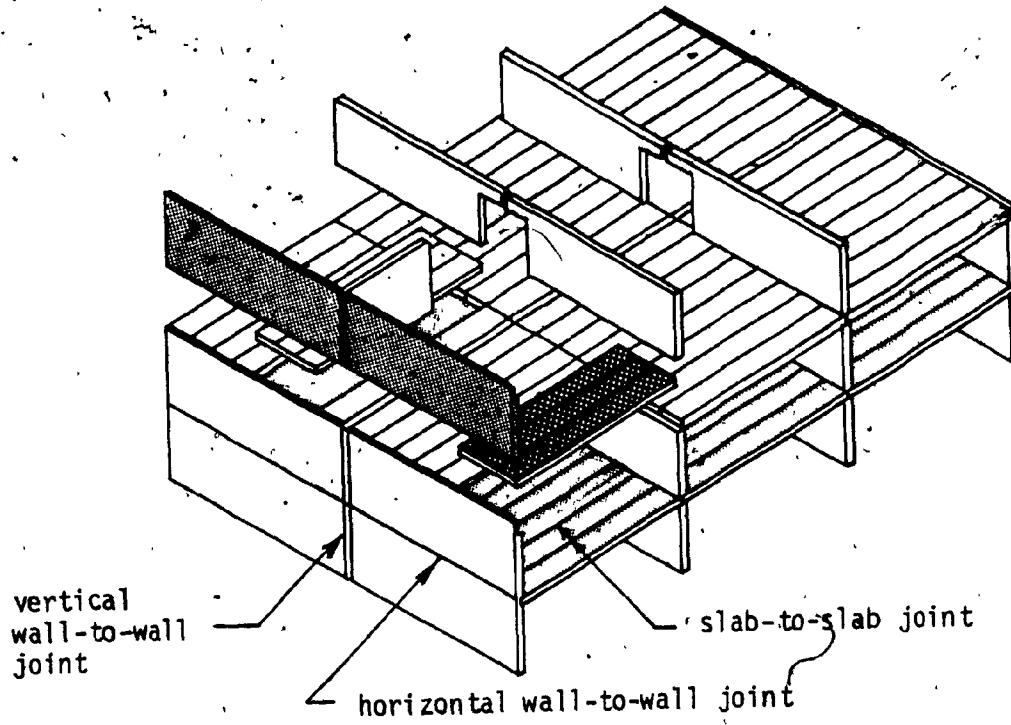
TYPES OF JOINTS IN LARGE PANEL BUILDING
